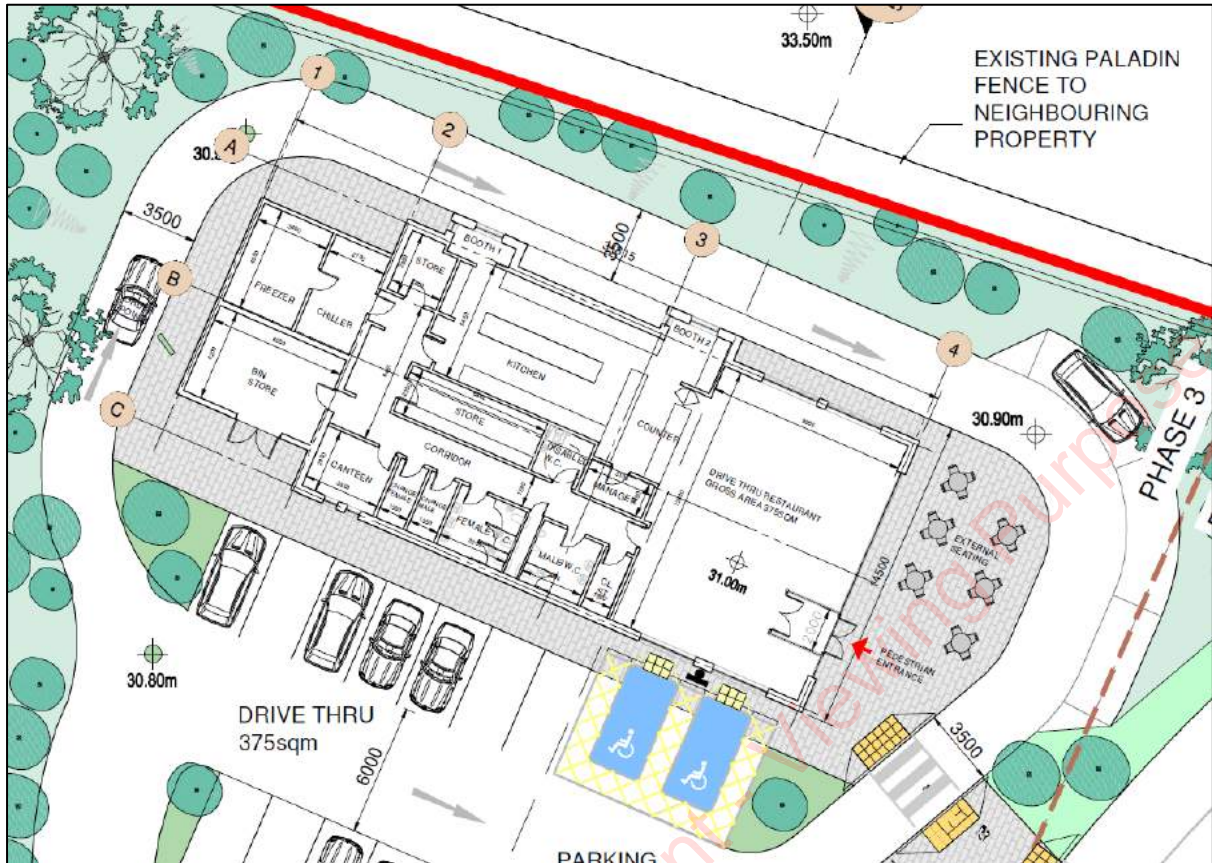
Extract from the ground floor plan showing the proposed Drive-Thru unit (Phase 3).
